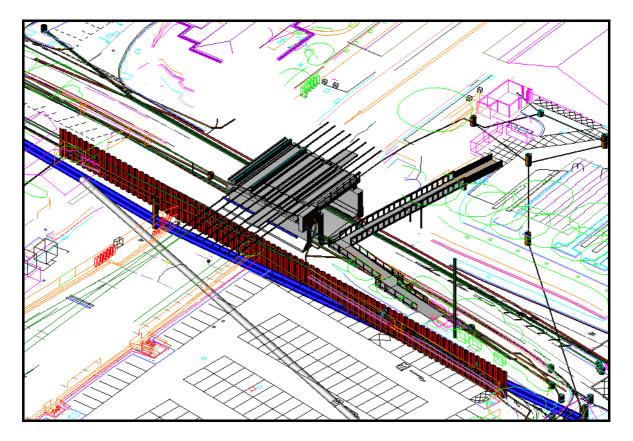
3D model extract at Botley Road, installation of Sheet Piles to South
